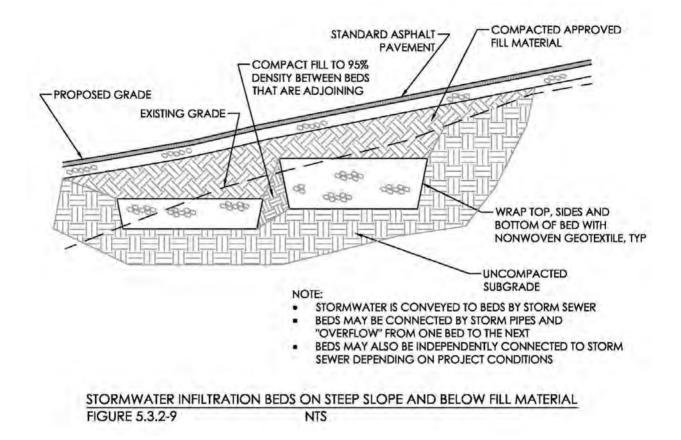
Cross-section of infiltration beds on slope and beneath fill material.
